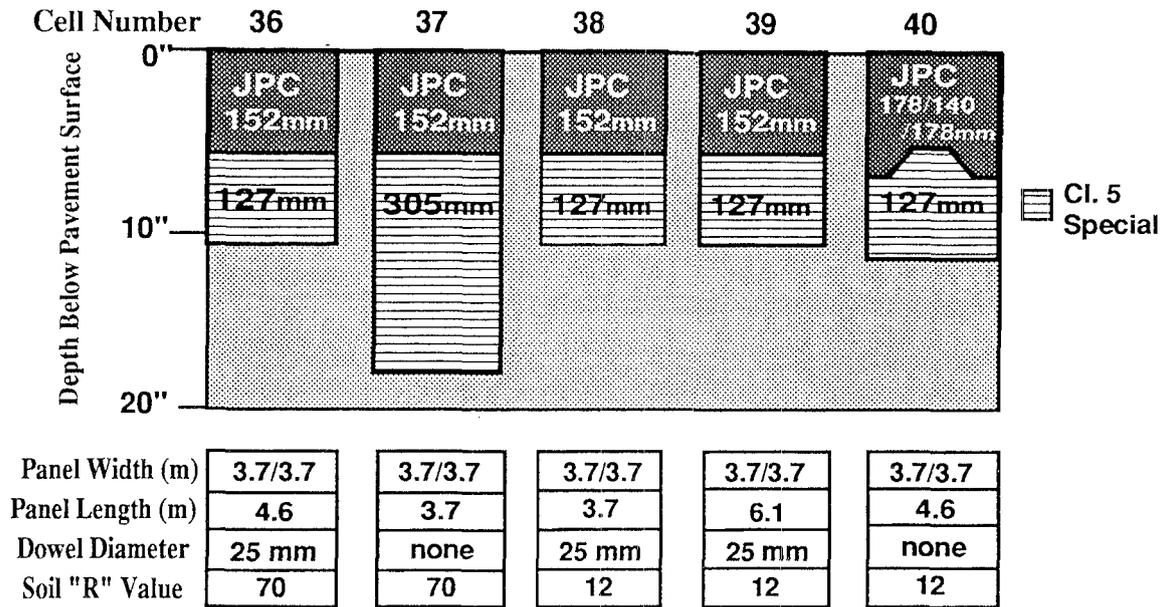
Mn/ROAD Low Volume Road Concrete Test Sections
